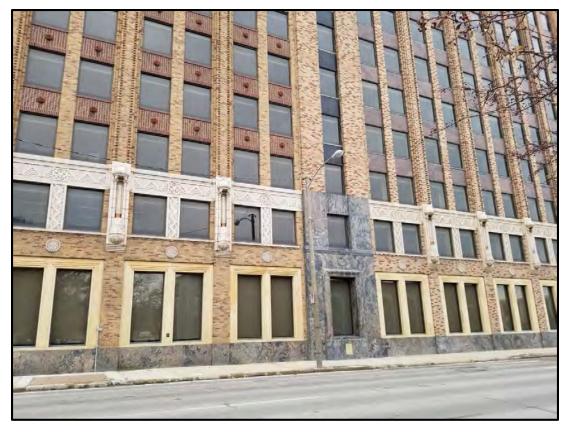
Portion of east elevation showing the 1929 build and the later addition on the right side.
